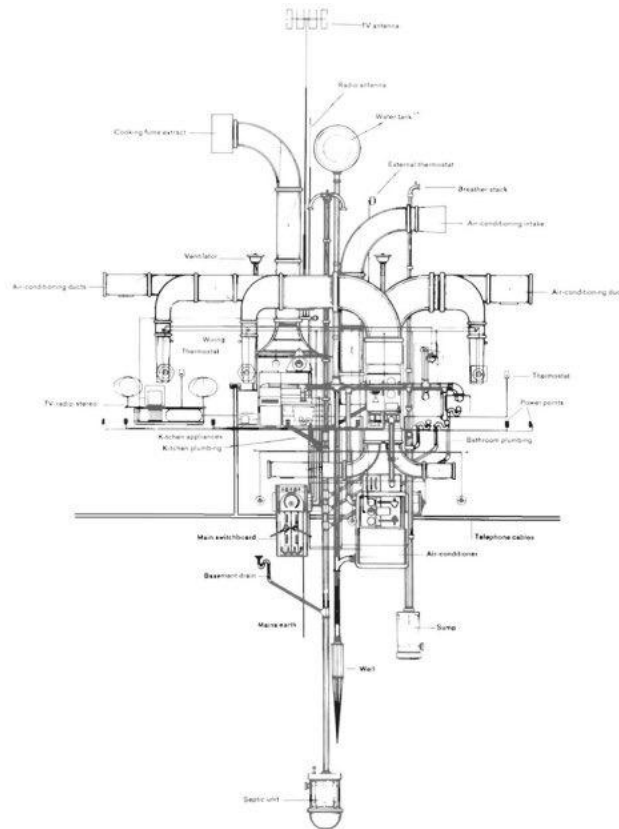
Banham, Reyner, Dallegret, François: 'A Home is Not a House'. Art in America, April 1965
